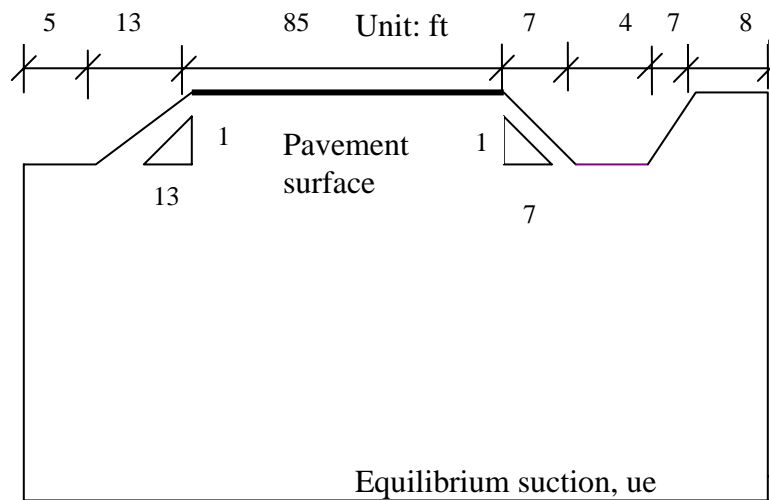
Fort Worth North Loop 820 study section B pavement cross section sketch
